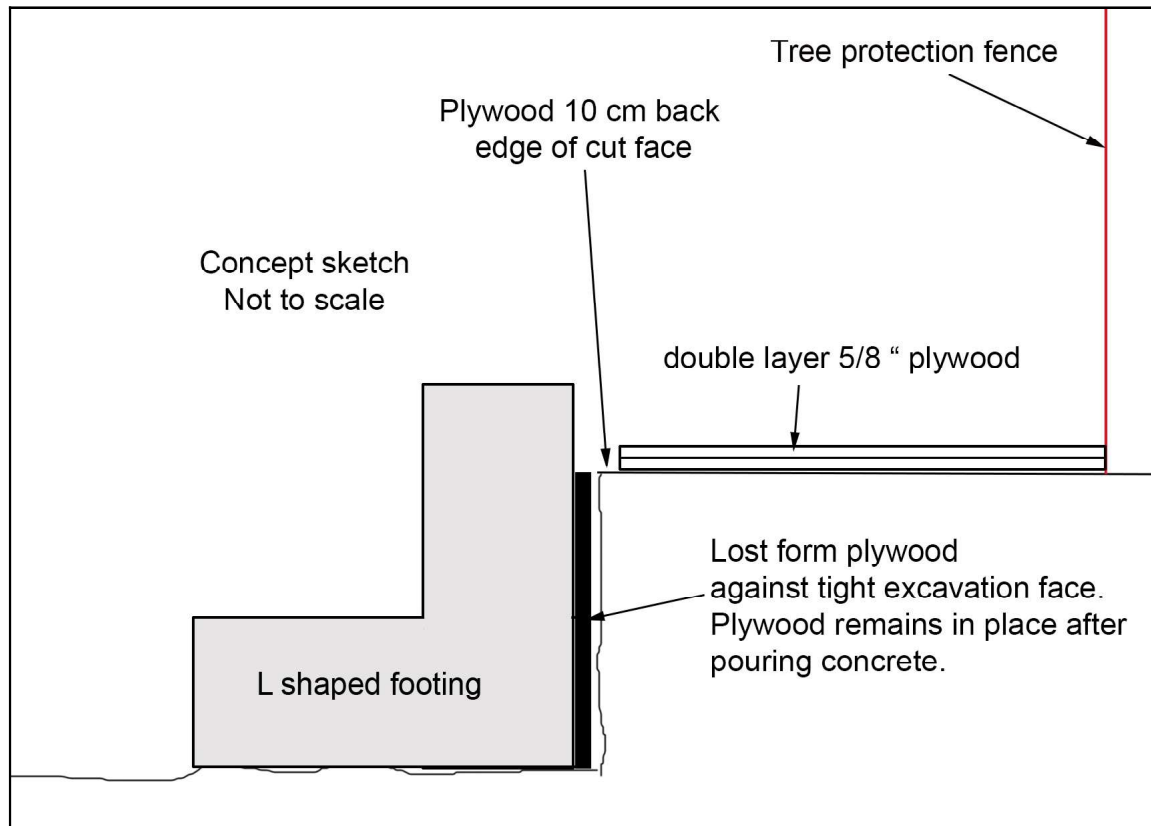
Concept sketch showing detail of foundation and ground plywood cover.
